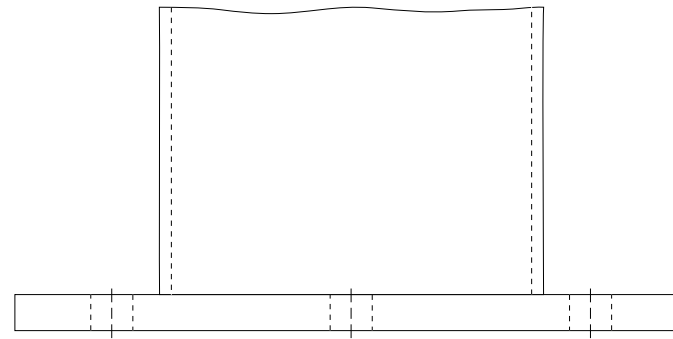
DETAIL G TUBULAR STEEL 6" x 4" x 1/4" BASEPLATE ASSEMBLY SIDE ELEVATION
